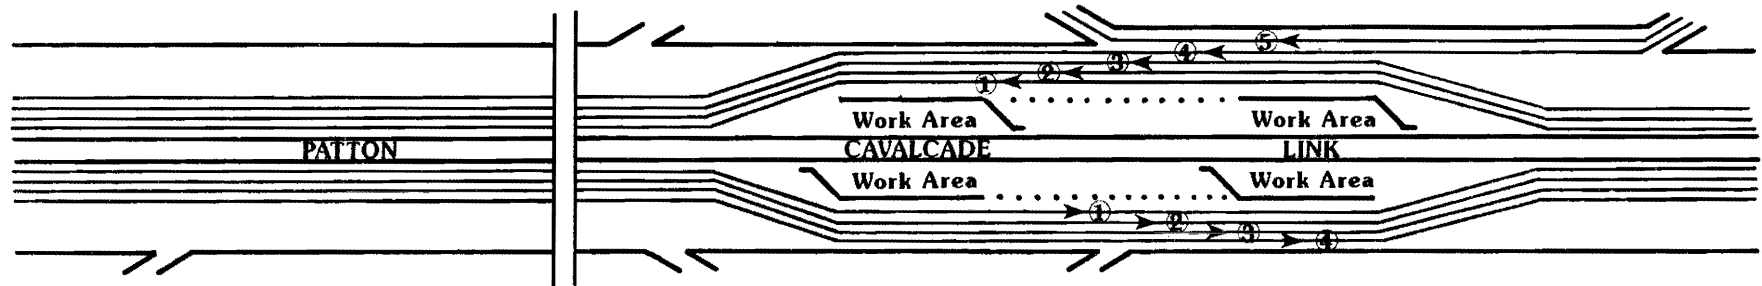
Traffic Control Plan for Bridge Deck Overlays
